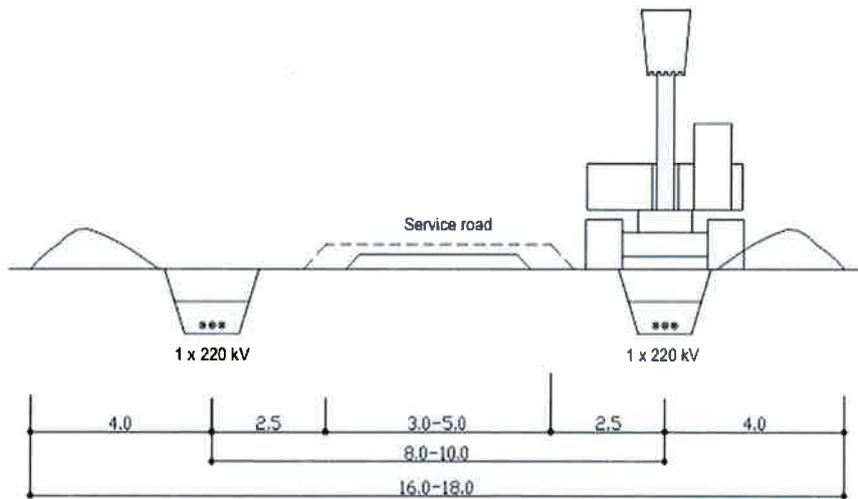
Maximum disturbance area for double set of 220 kV cables with service road between the two trenches. Excavated soil is placed beside the trench.
